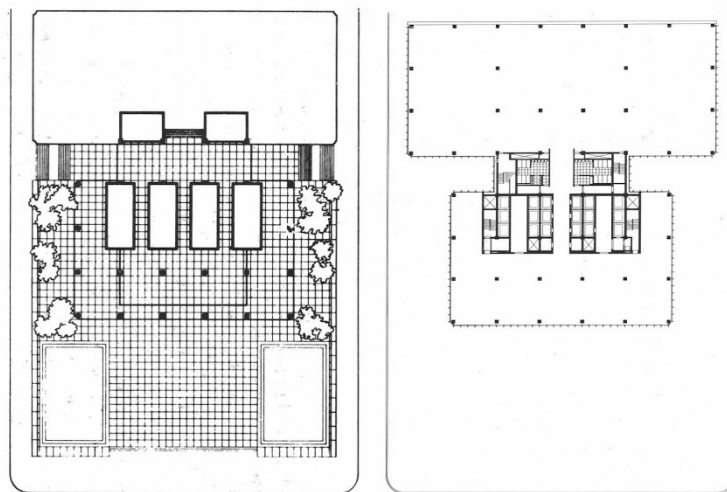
Seagram Building plan at street level and typical floor plan by Mies van der Rohe in New York, 1954. David Spaeth, *Mies van der Rohe* (New York: Rizzoli, 1978), 166.
